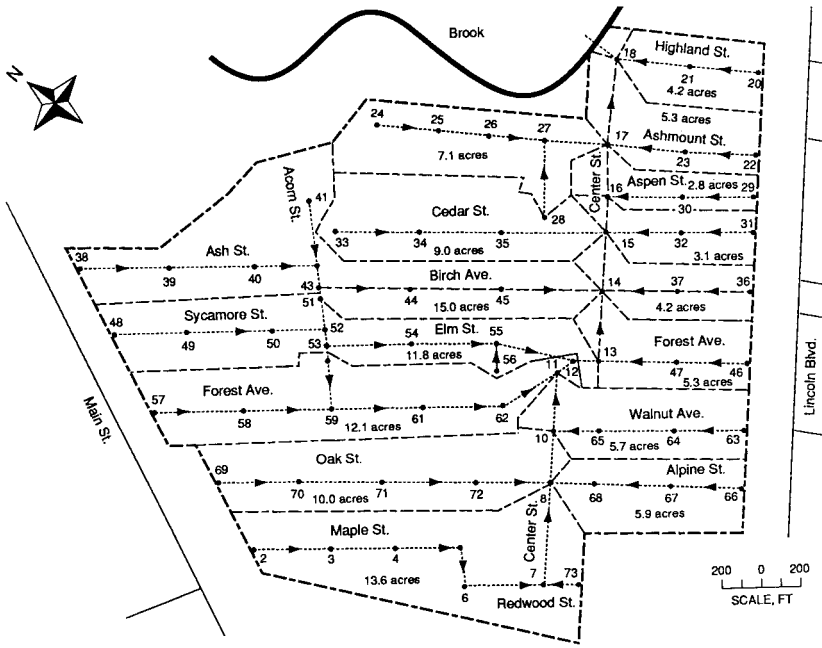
Map showing manholes, sewer lines, and subareas for sanitary sewer design example. (Adapted from Ref. 8.)
